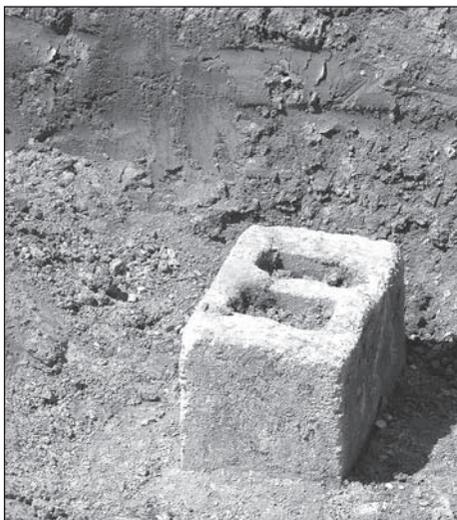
Concrete block POW camp barracks foundation pier from site 23PU1869.
